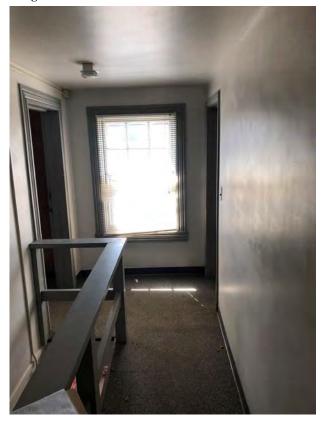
LBP Positive, Gray Decorative Wood Window Frame/Casing and White Drywall Ceiling.
